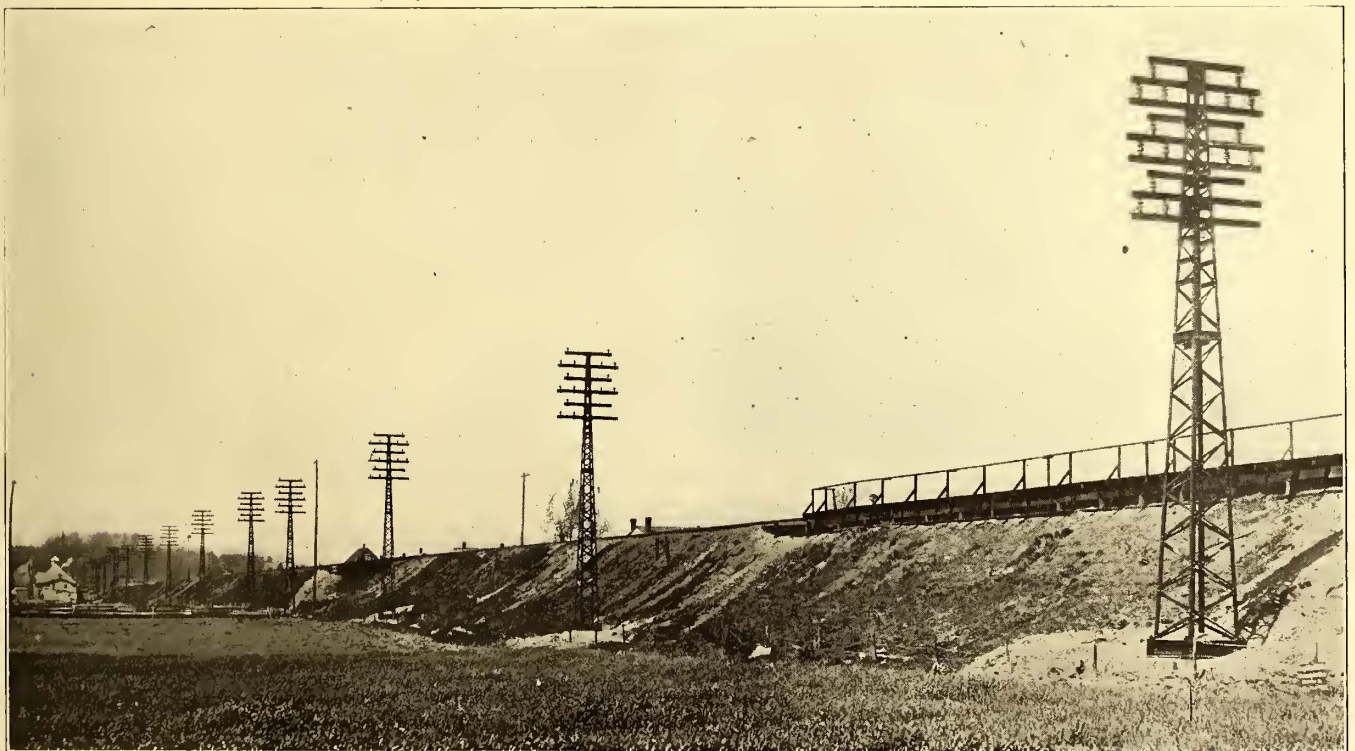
MAIN OVERHEAD TRUNK LINE NEAR WOODHAVEN JUNCTION
